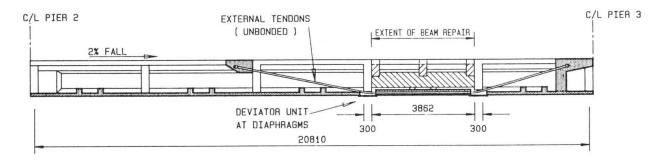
Typical elevation of beam resonstruction (Seventh Ave)
